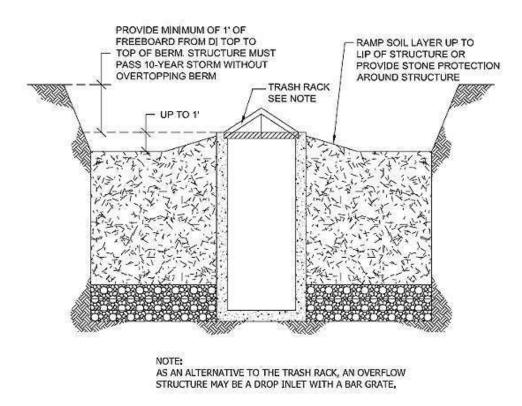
Typical Detail of how to prevent bypass or short-circuiting around the overflow structure
